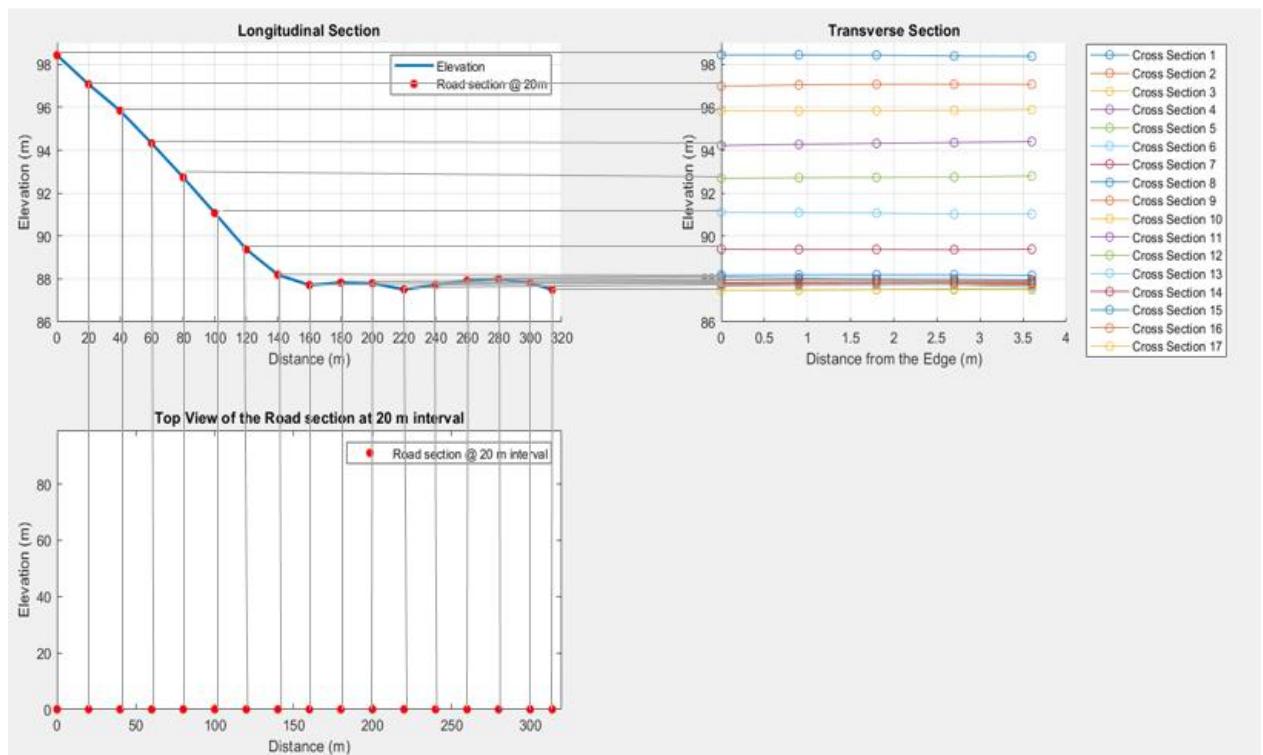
Longitudinal section, Traverse, and Top view of Road Profile.
